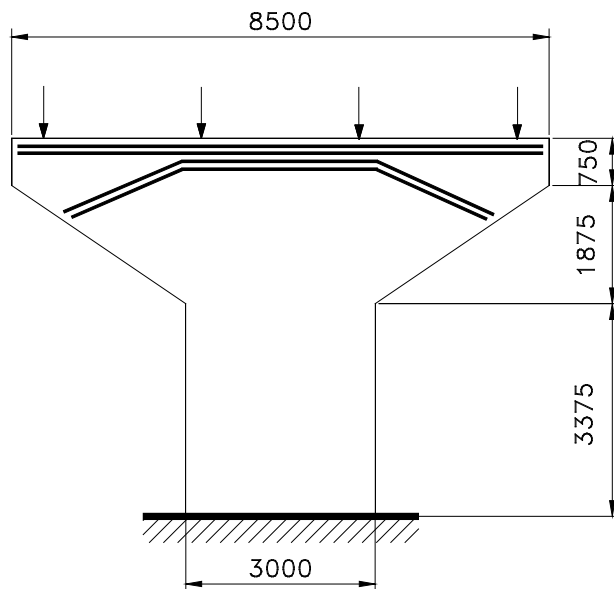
Arrangement of Main Steel Reinforcement in the Bridge Pier
